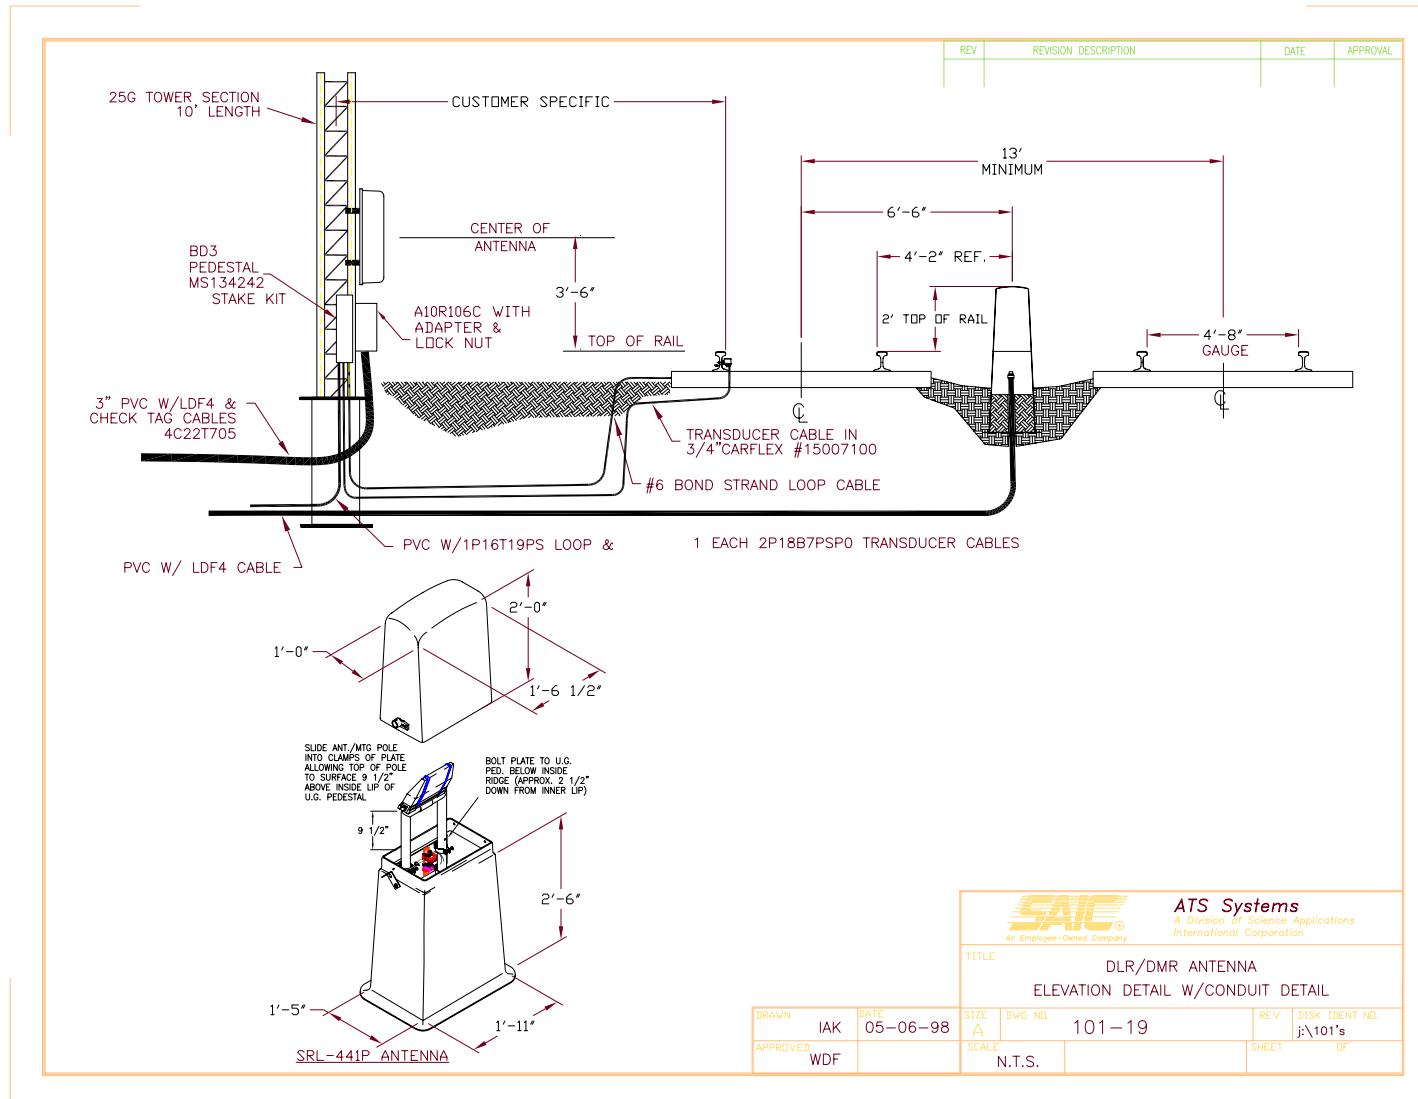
DLR/DMR Antenna Elevation Detail w/Conduit Detail
